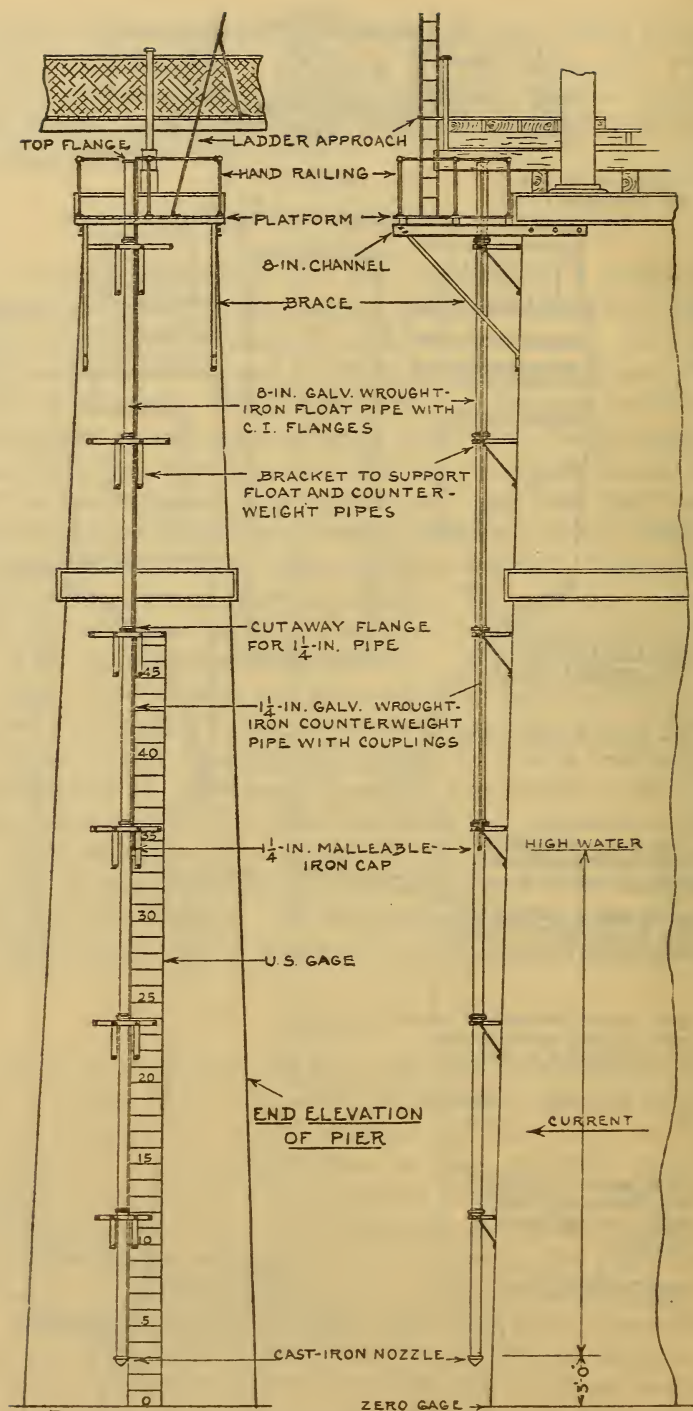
Float and counterweight pipes attached outside of bridge pier.
